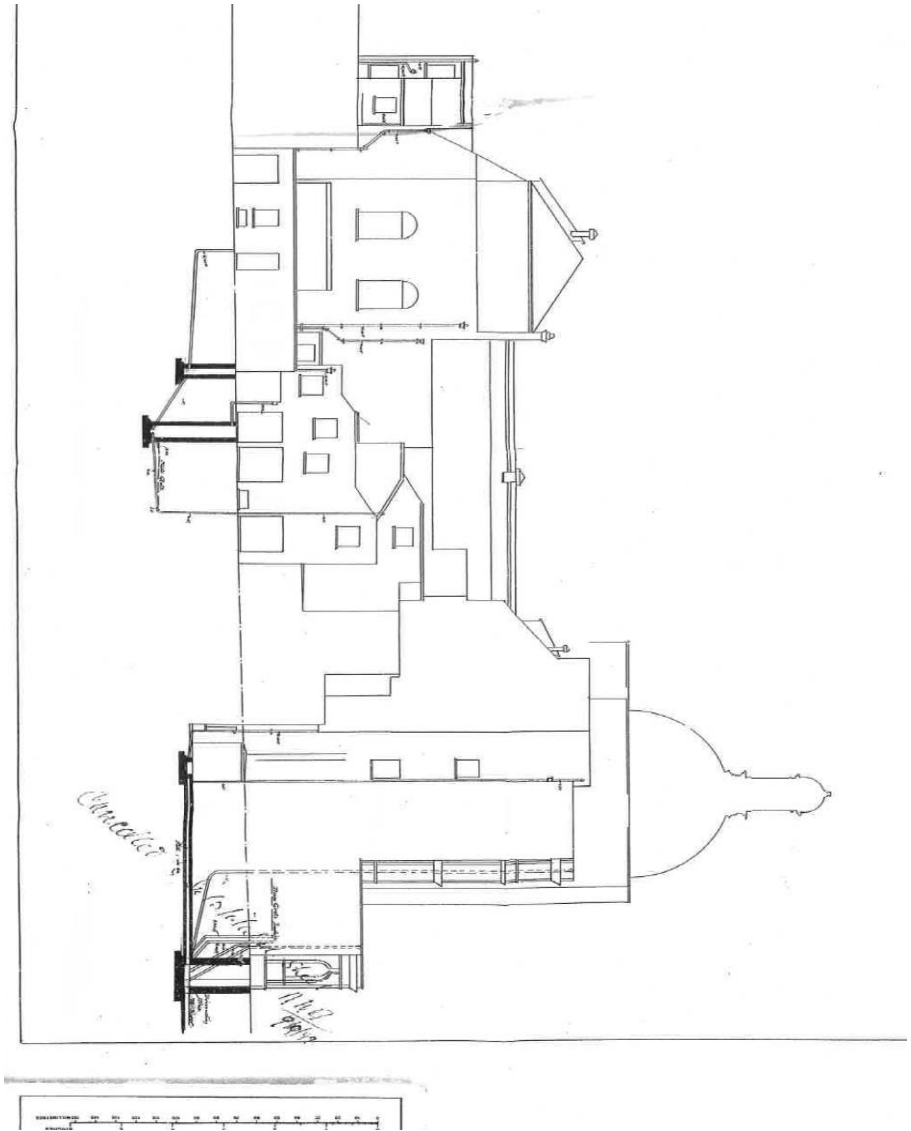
Elevation to Bayham Place – this elevation has largely remained the same.
